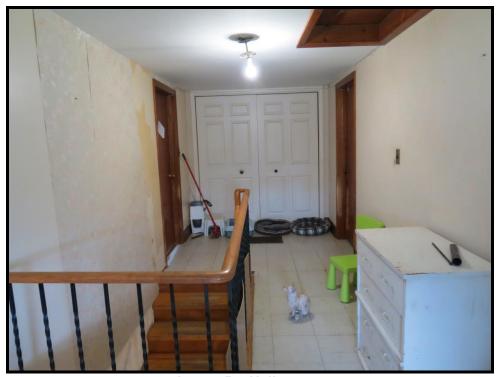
Hallway (Photo taken on June 13, 2018; Facing West)
